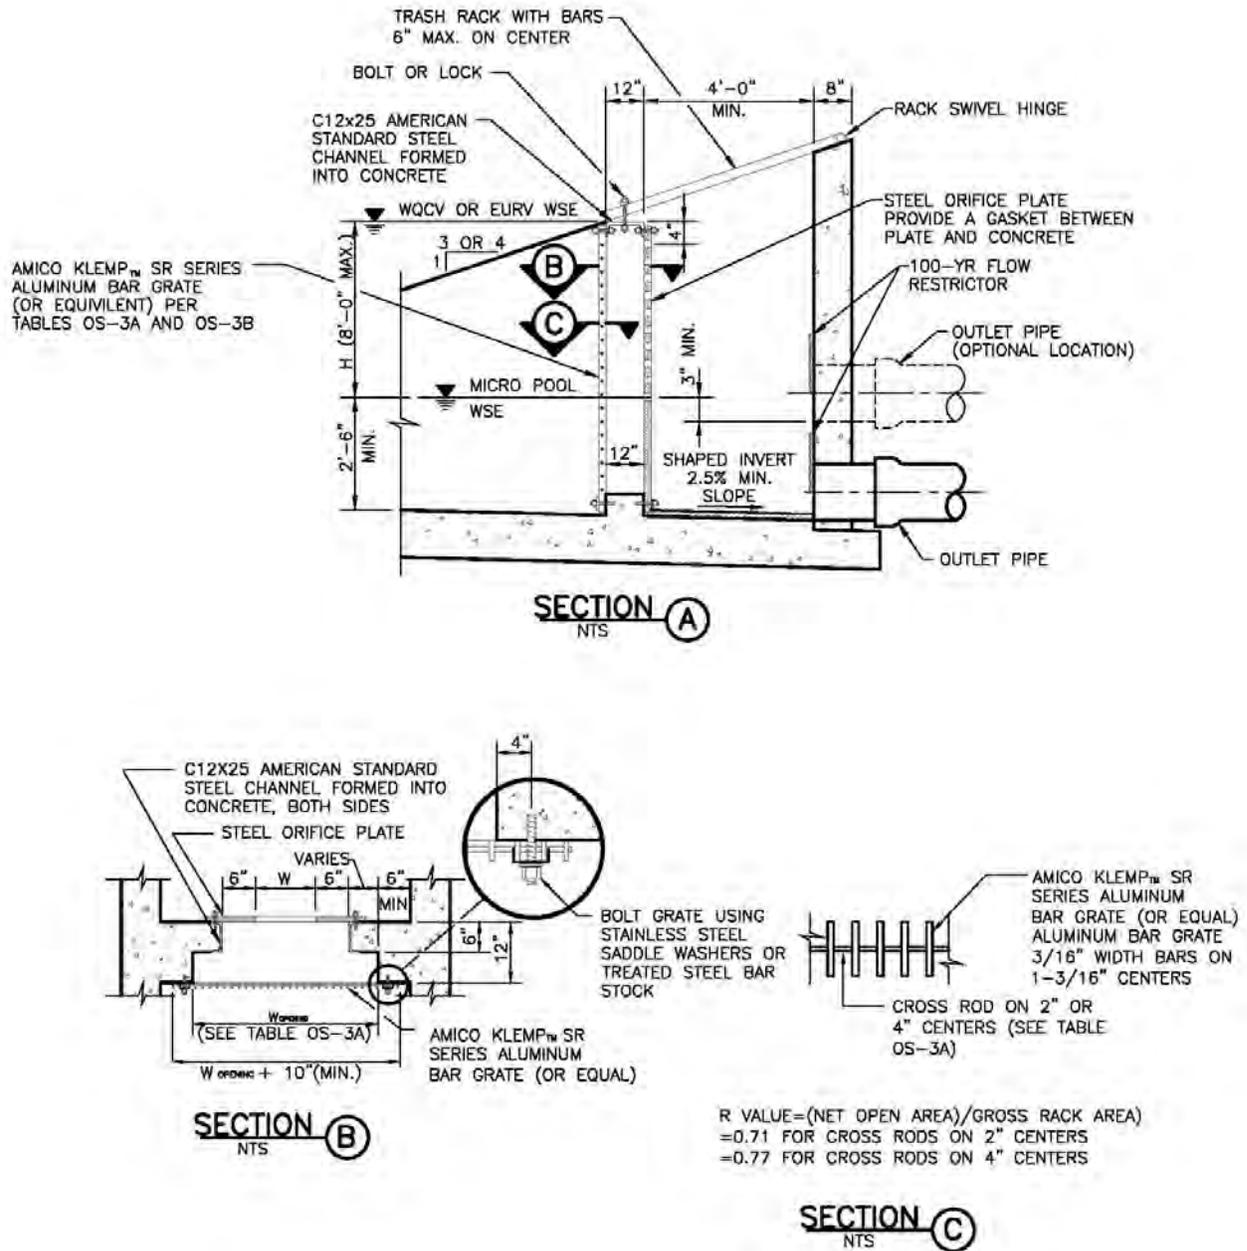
Typical Outlet Structure with Rectangular Orifice Plate
